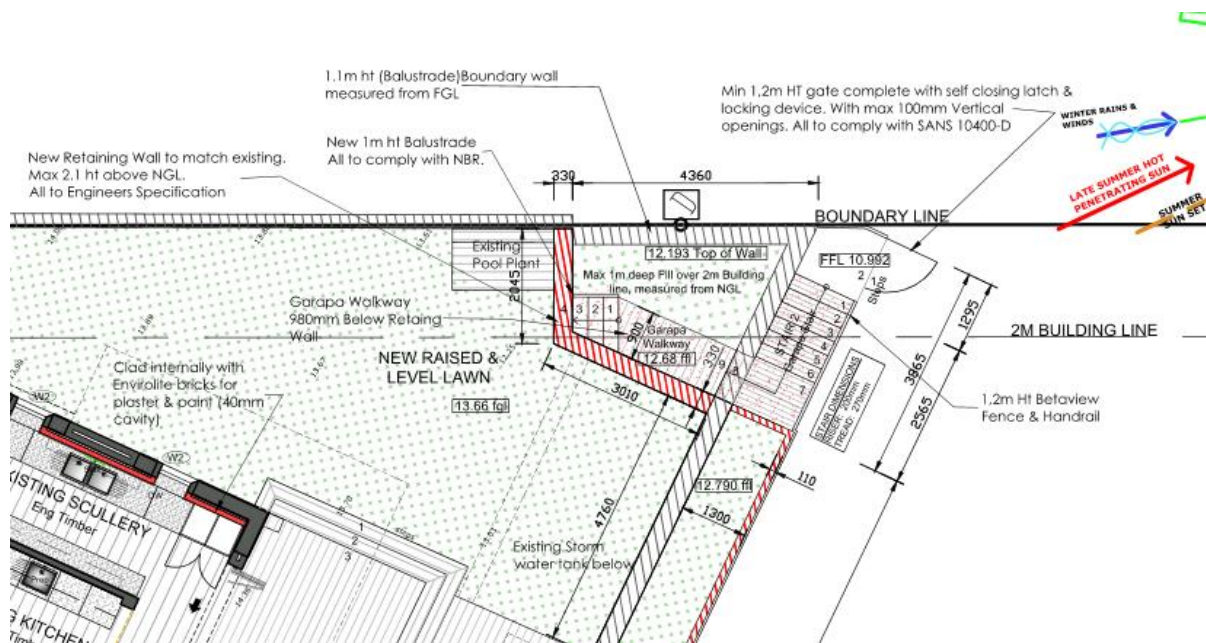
First storey plan – retaining wall, canter lever planter and balustrade
